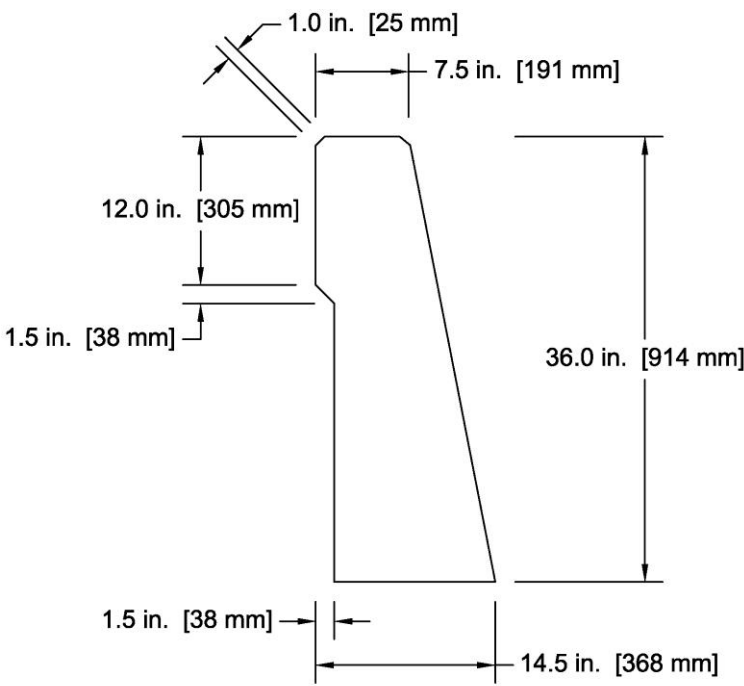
Texas 10.8-Degree Single-Slope Bridge Rail [6]
